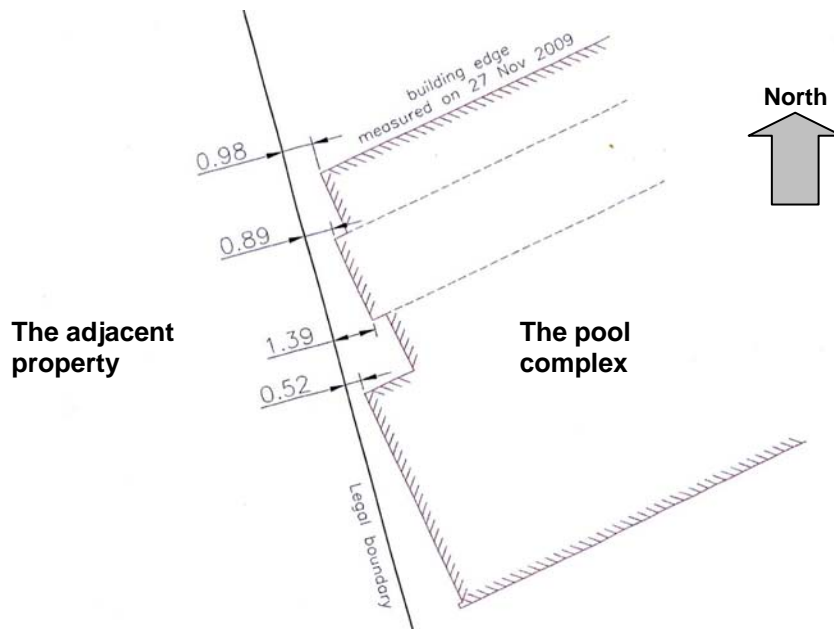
"As built" boundary plan showing closest approach of the various wall segments to the boundary
